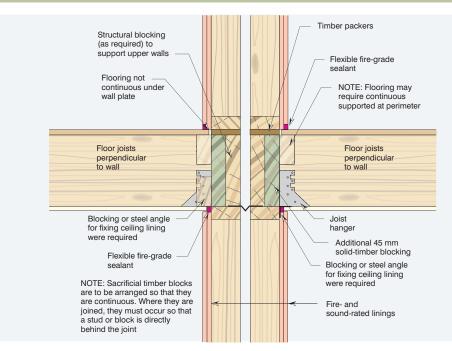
Joist perpendicular to wall and supported off timber blocks - FRL 60 minutes - elevation view.
